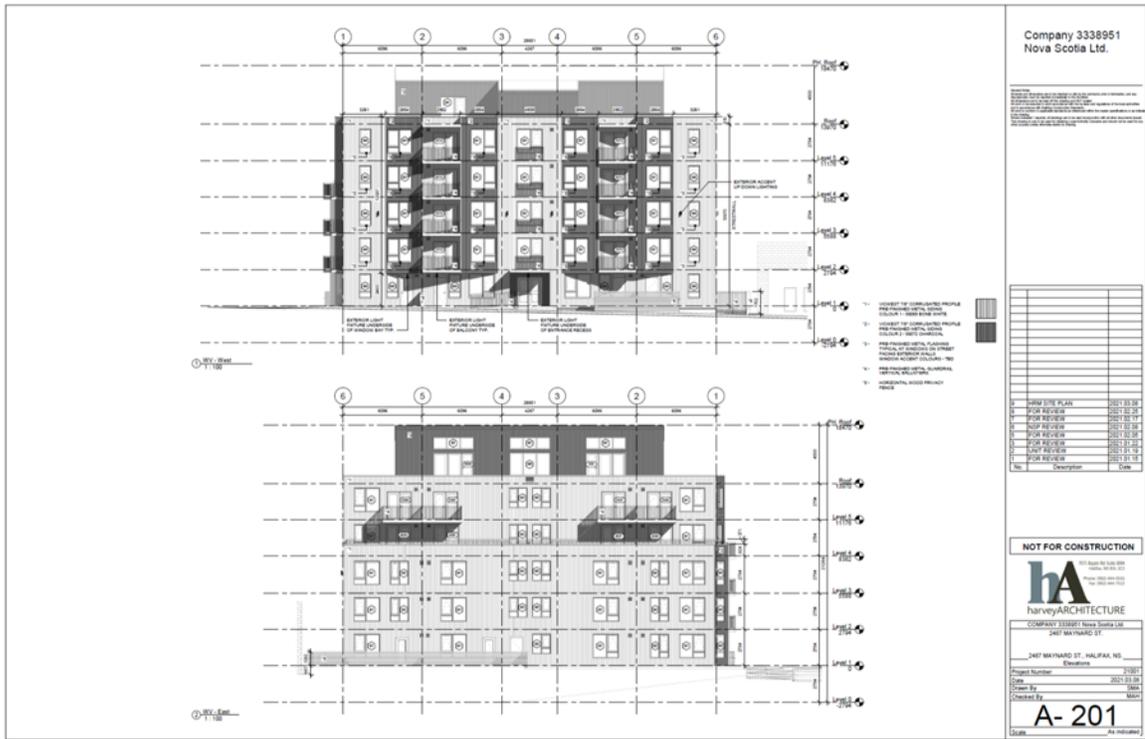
2487 Maynard Street Proposed Elevations North and South
